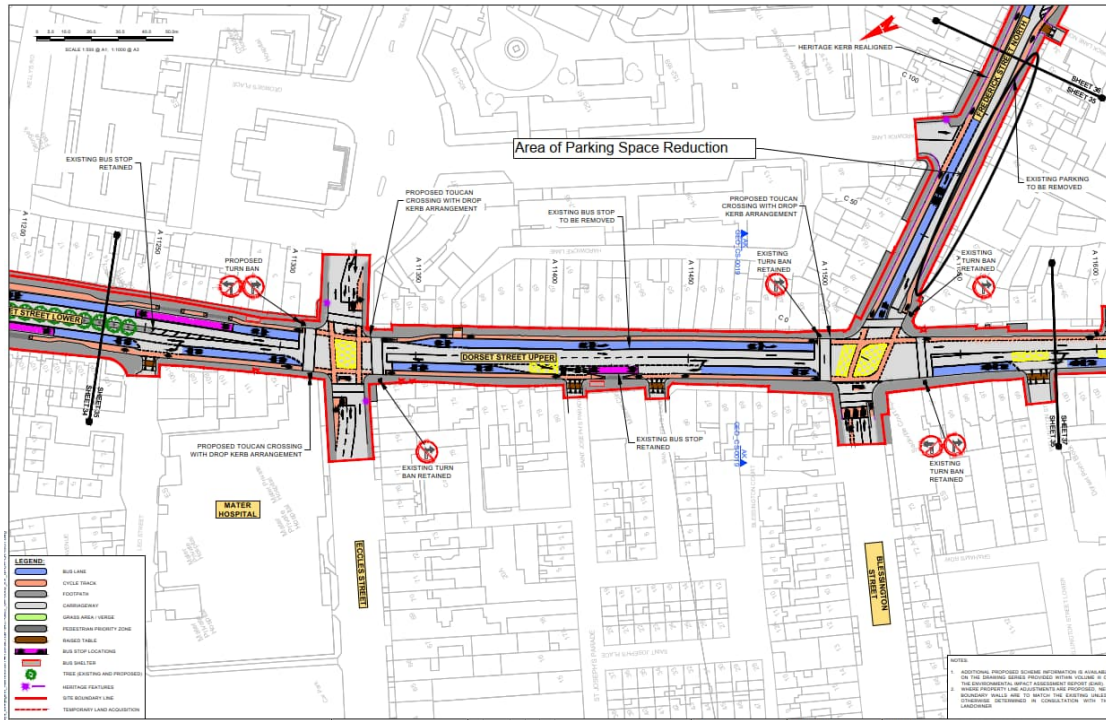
Commercial Parking Impact: Paid Parking – Frederick Street North
